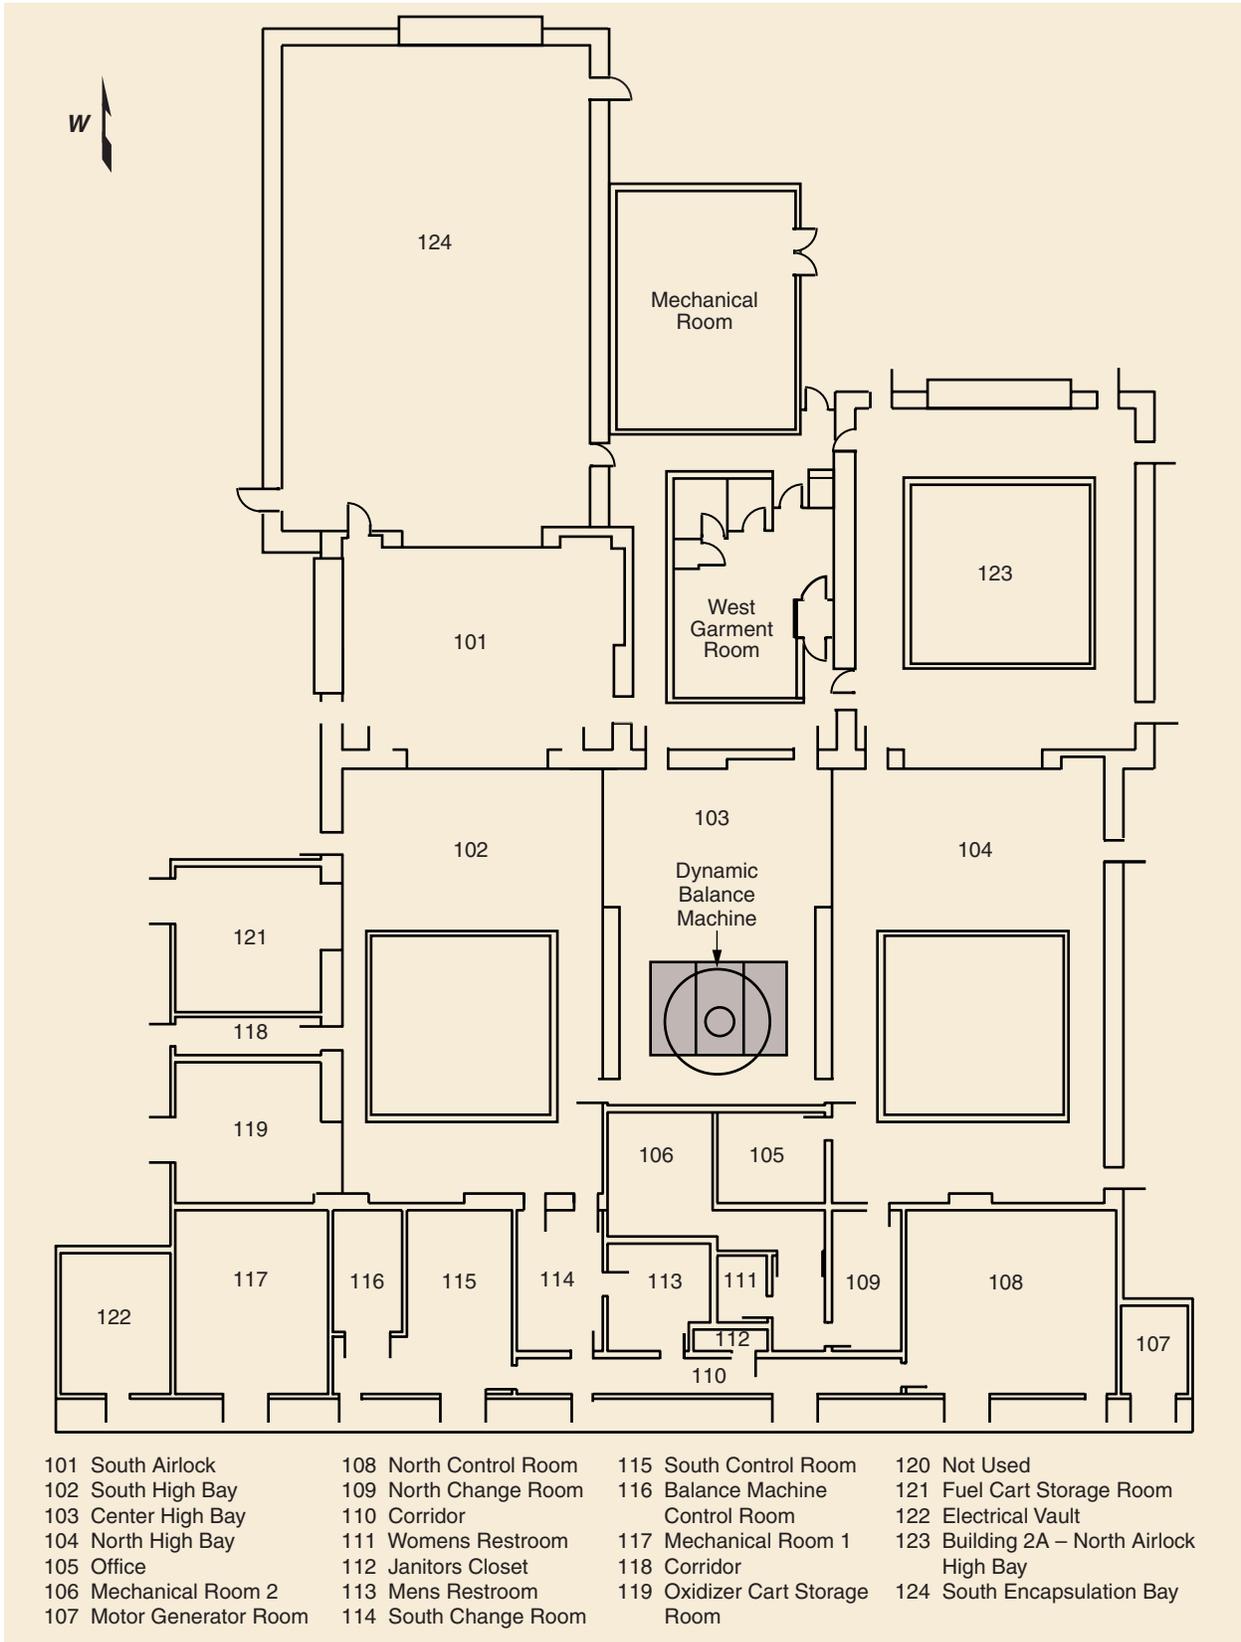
Building 2 (HPF) Detailed Floor Plan, Astrotech
